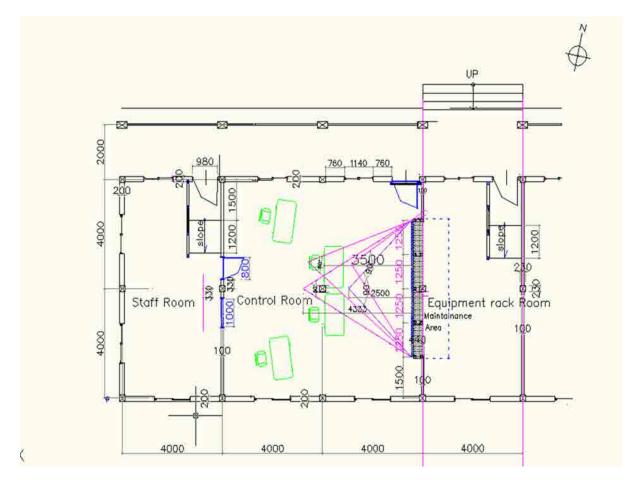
Recommended Interior Layout Plan of Proposed TCC
